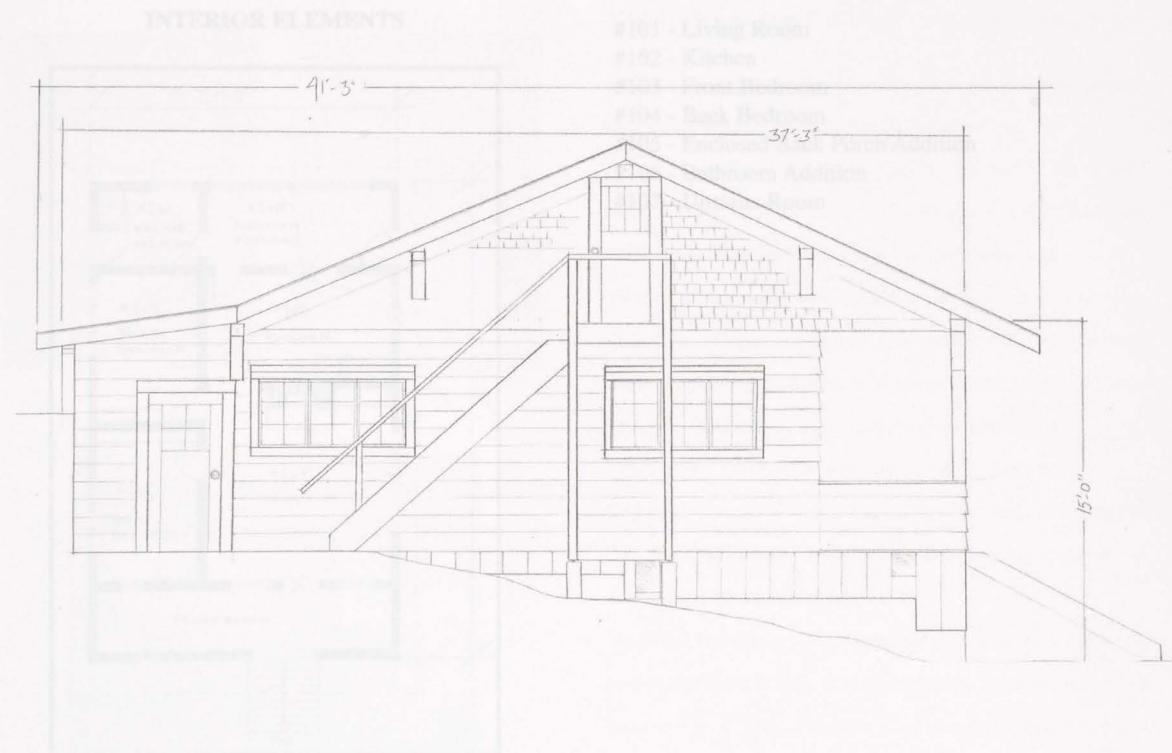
Wendel House, west elevation, drawn to scale. Drawing by L.Over
